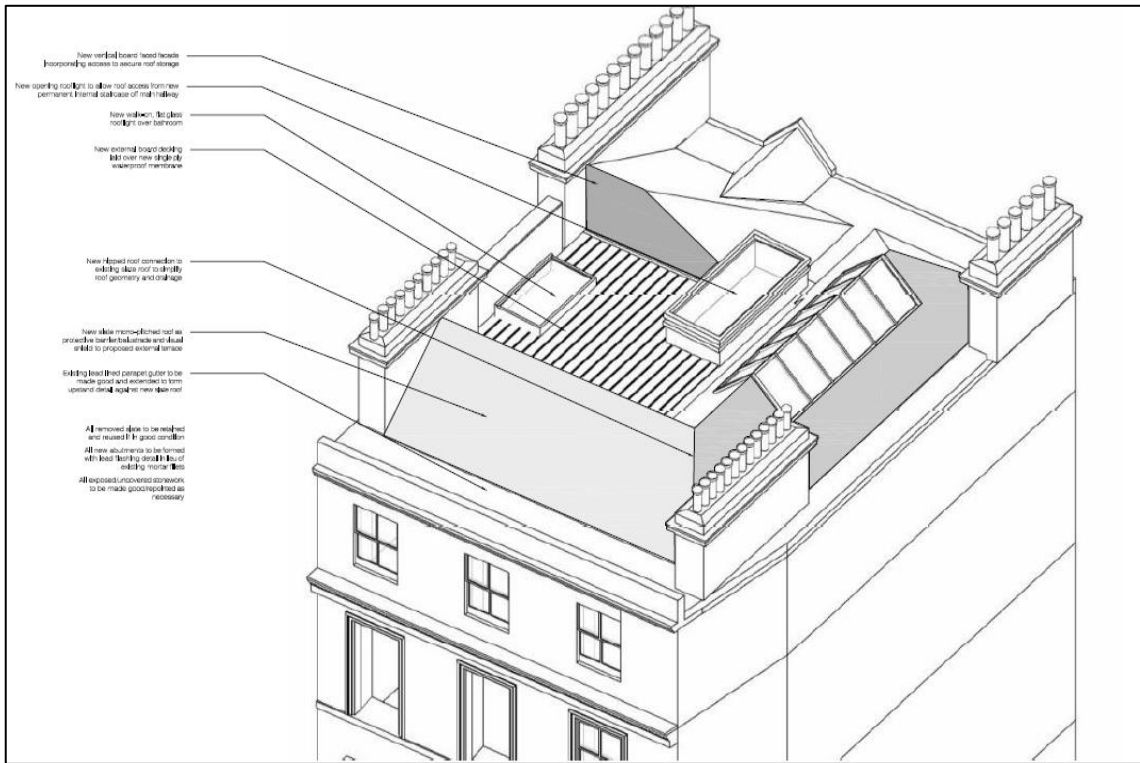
3D Visual of Proposed Rooftop (Richard Murphy Architects Drawing no. AL/02/02)
